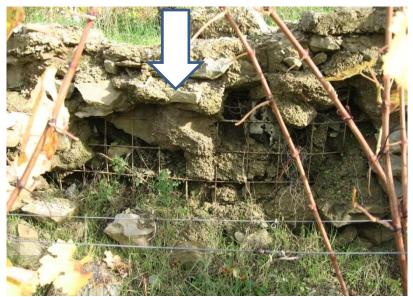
A new wall, already fallen. The armour of concrete can be noted behind, indicated by a white arrow.
